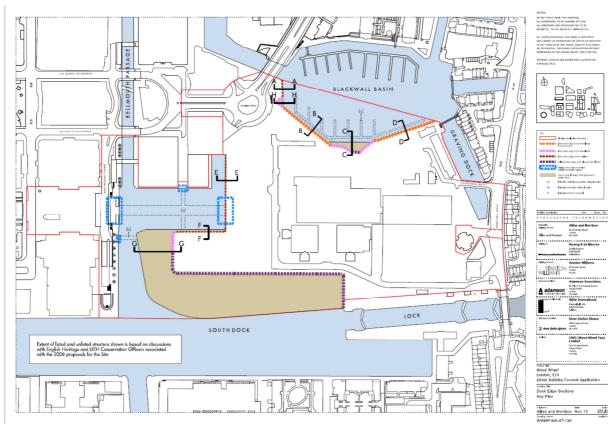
Showing extent of listed and unlisted dock wall to be demolished or modified
